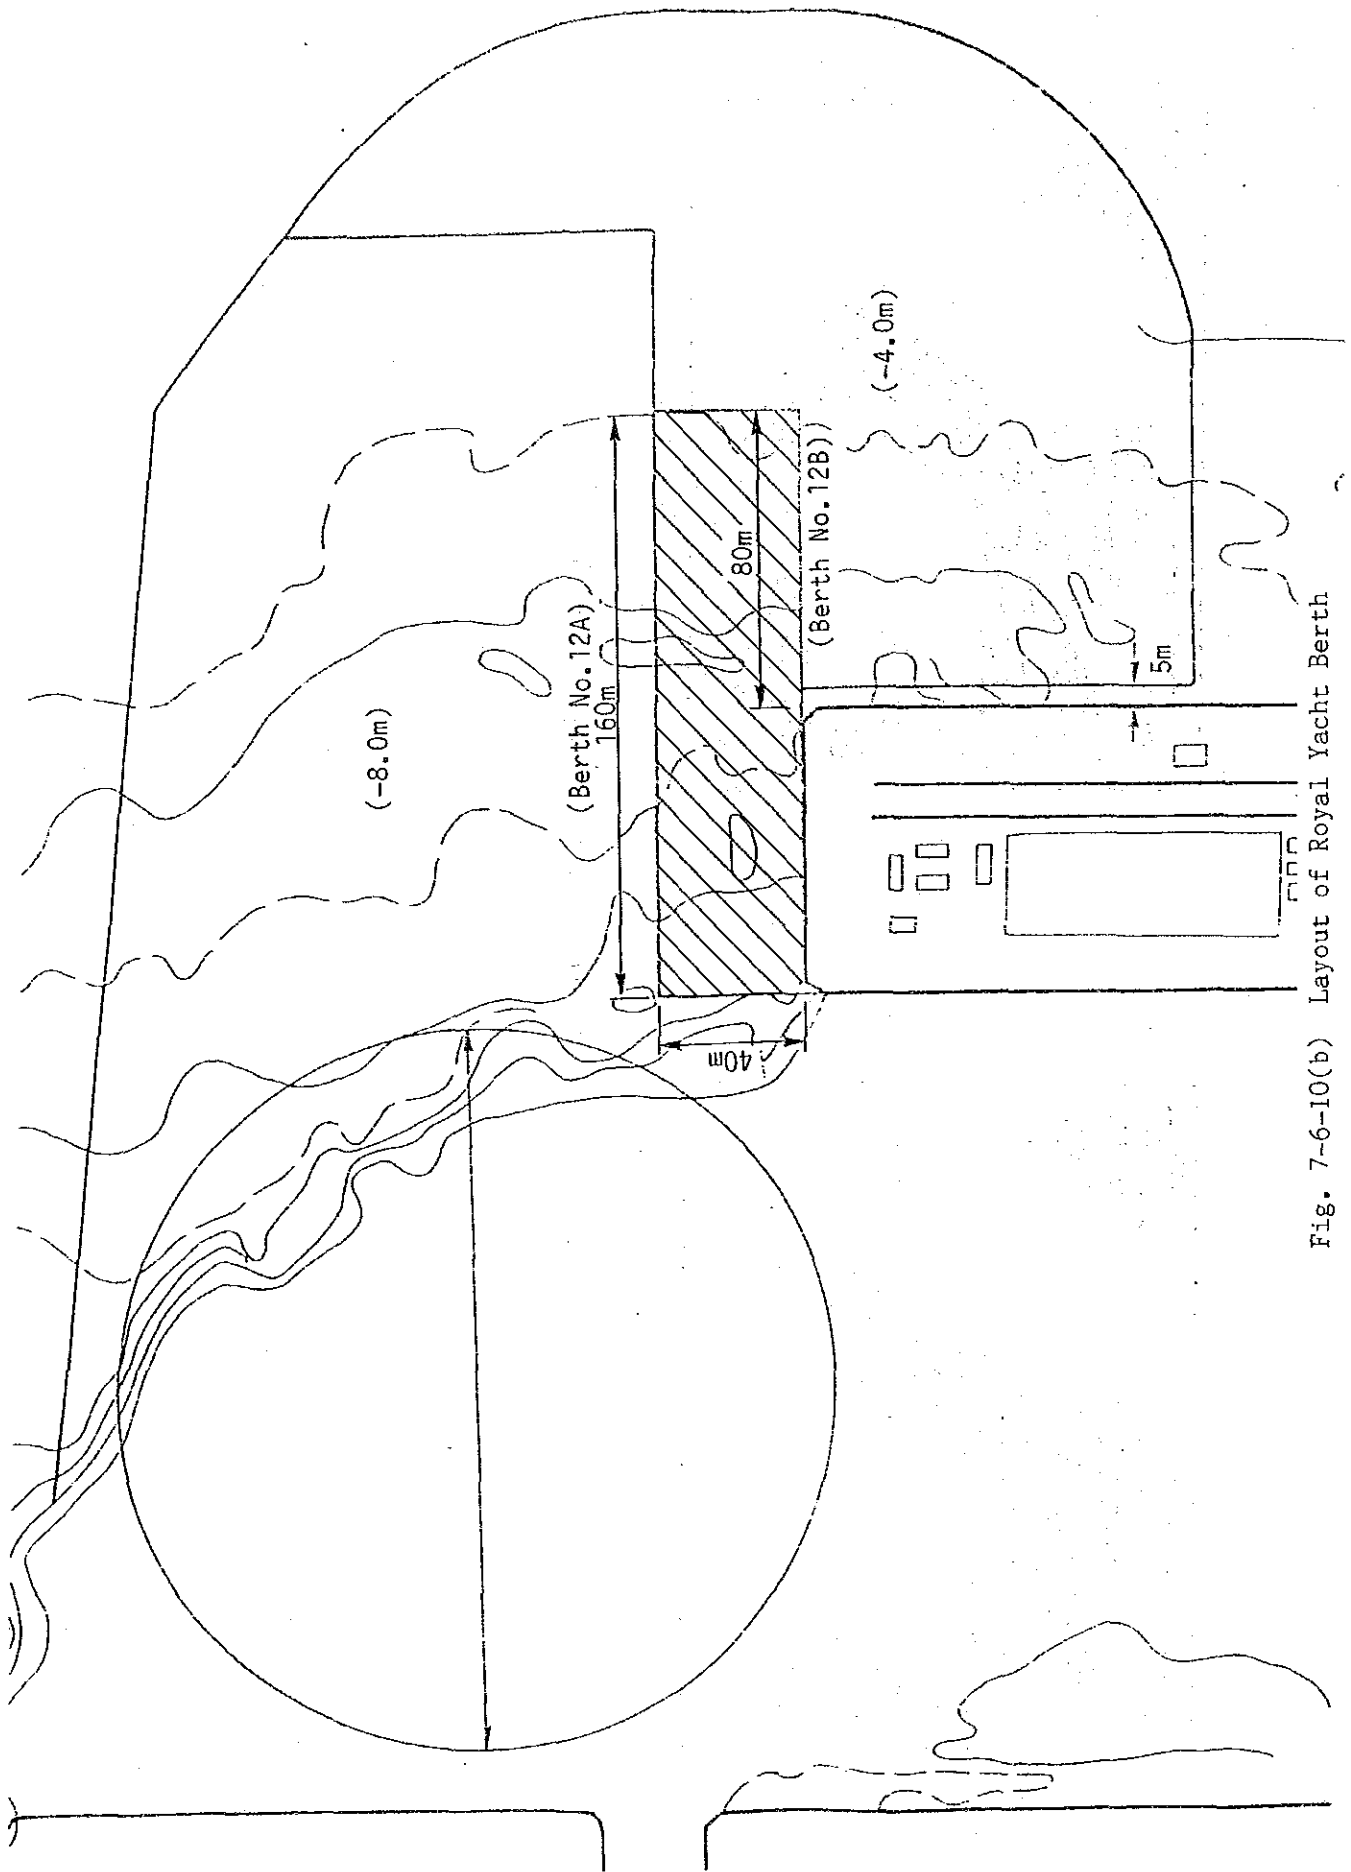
(b) Layout of Royal Yacht Berth
